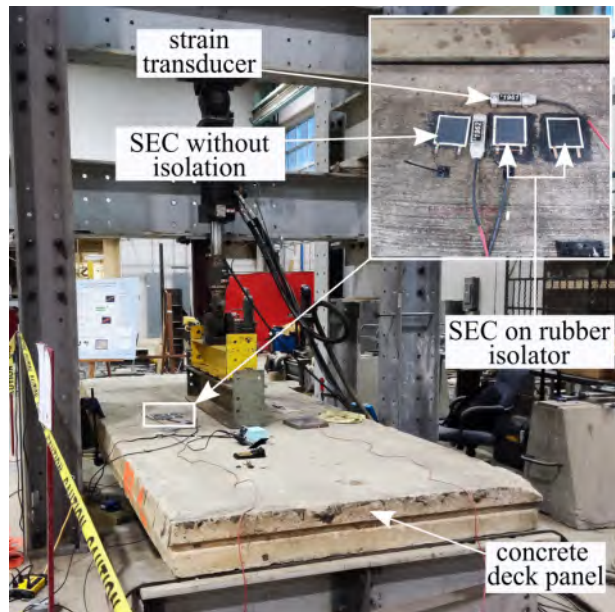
Experimental setup for full-scale reinforced concrete deck panel.
